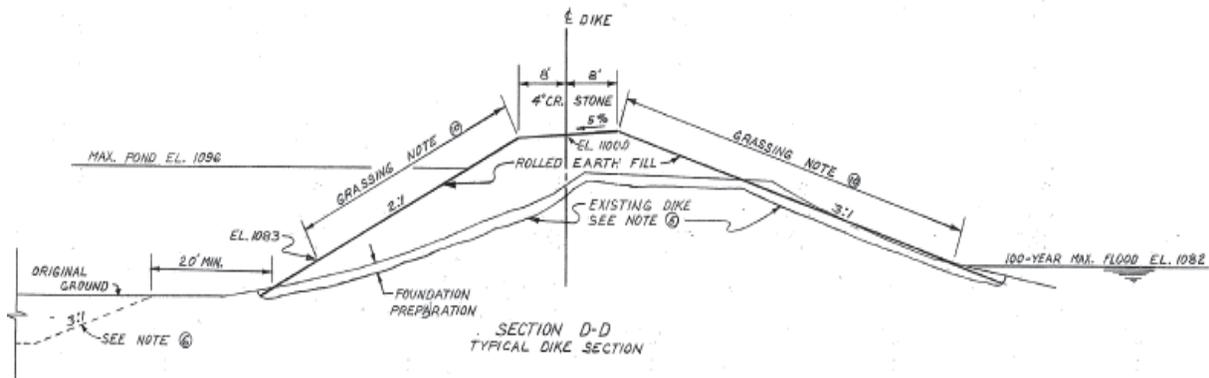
Dry Fly Ash Stack- Typical West Section (As Built 1975)
